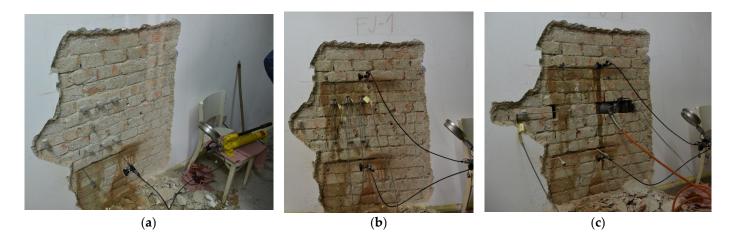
(a) Connected hydraulic system and flat jack; (b) Determination of stress and deformation dependence of masonry; (c) Testing of shear strength of masonry with control of vertical stress by flat jacks. (photo credit: Luka Lulić).
